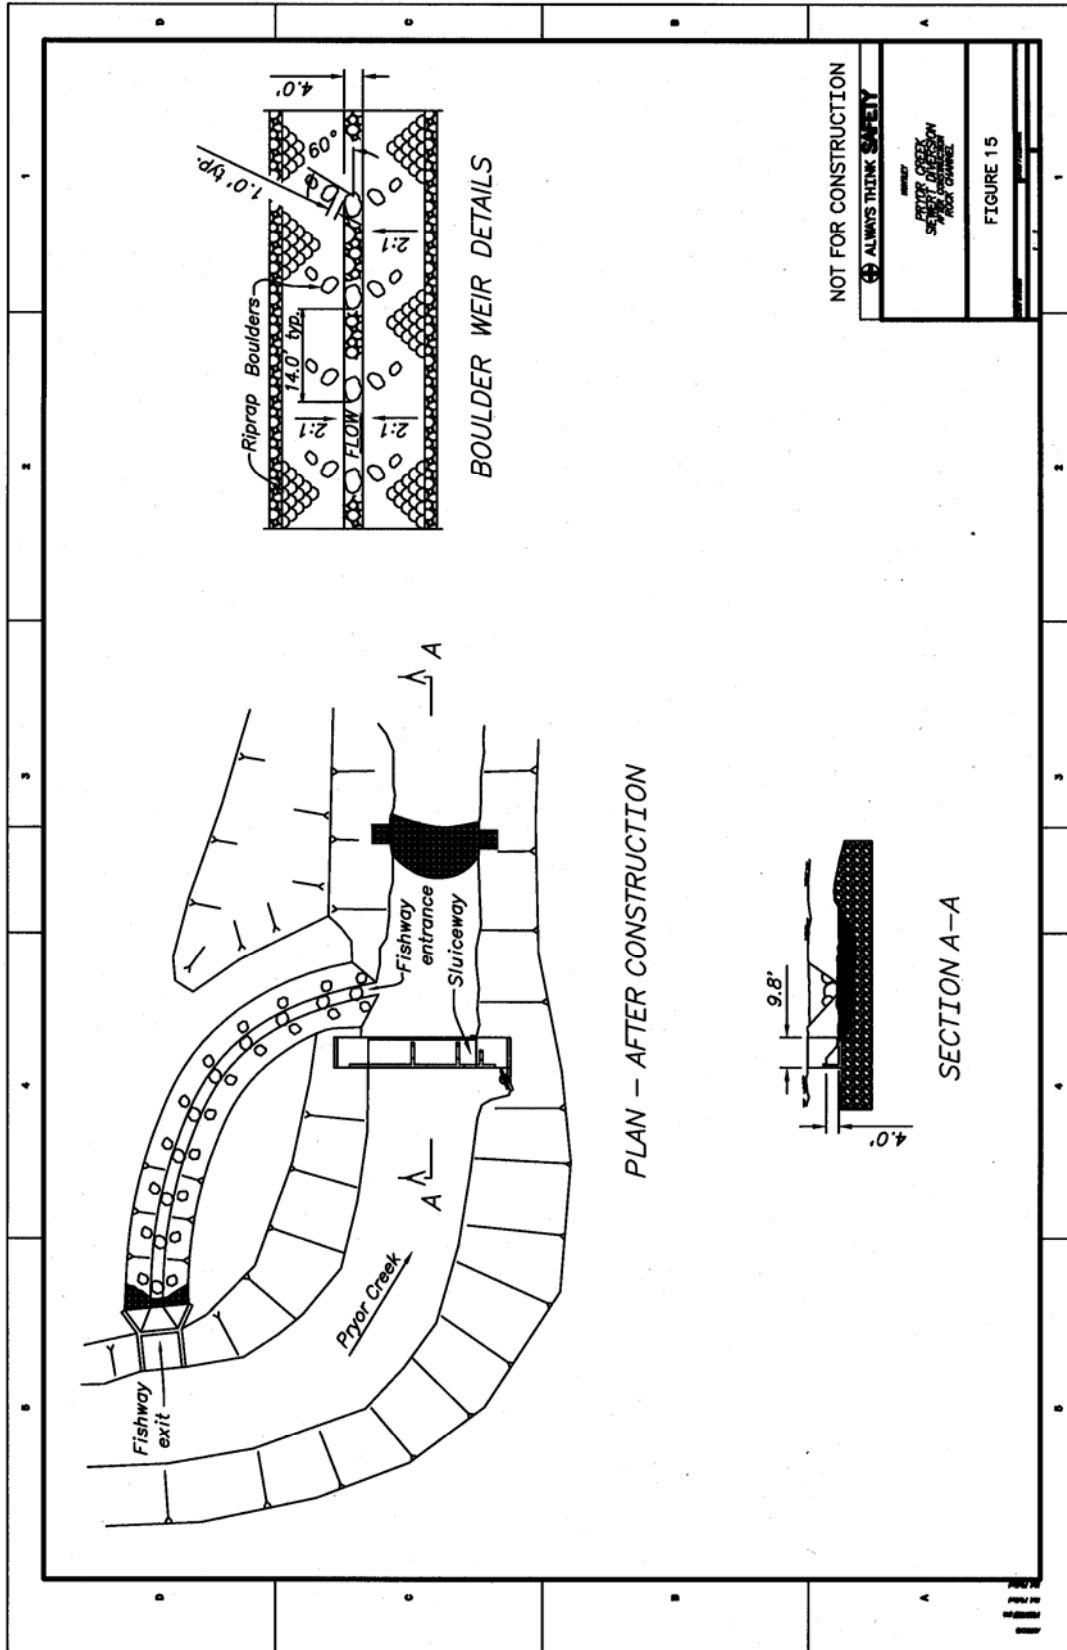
Plan and Sections of a rock with boulder weirs fishway option, Siewert Diversion Dam on Pryor Creek
